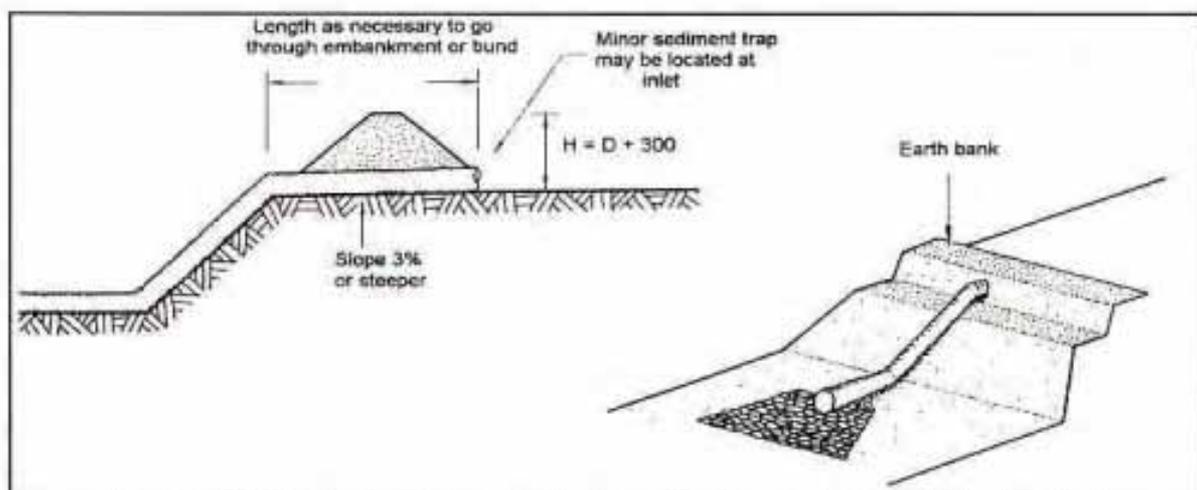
Piping runoff over embankment (ref. Inst. of Eng., Australia, 1996)
